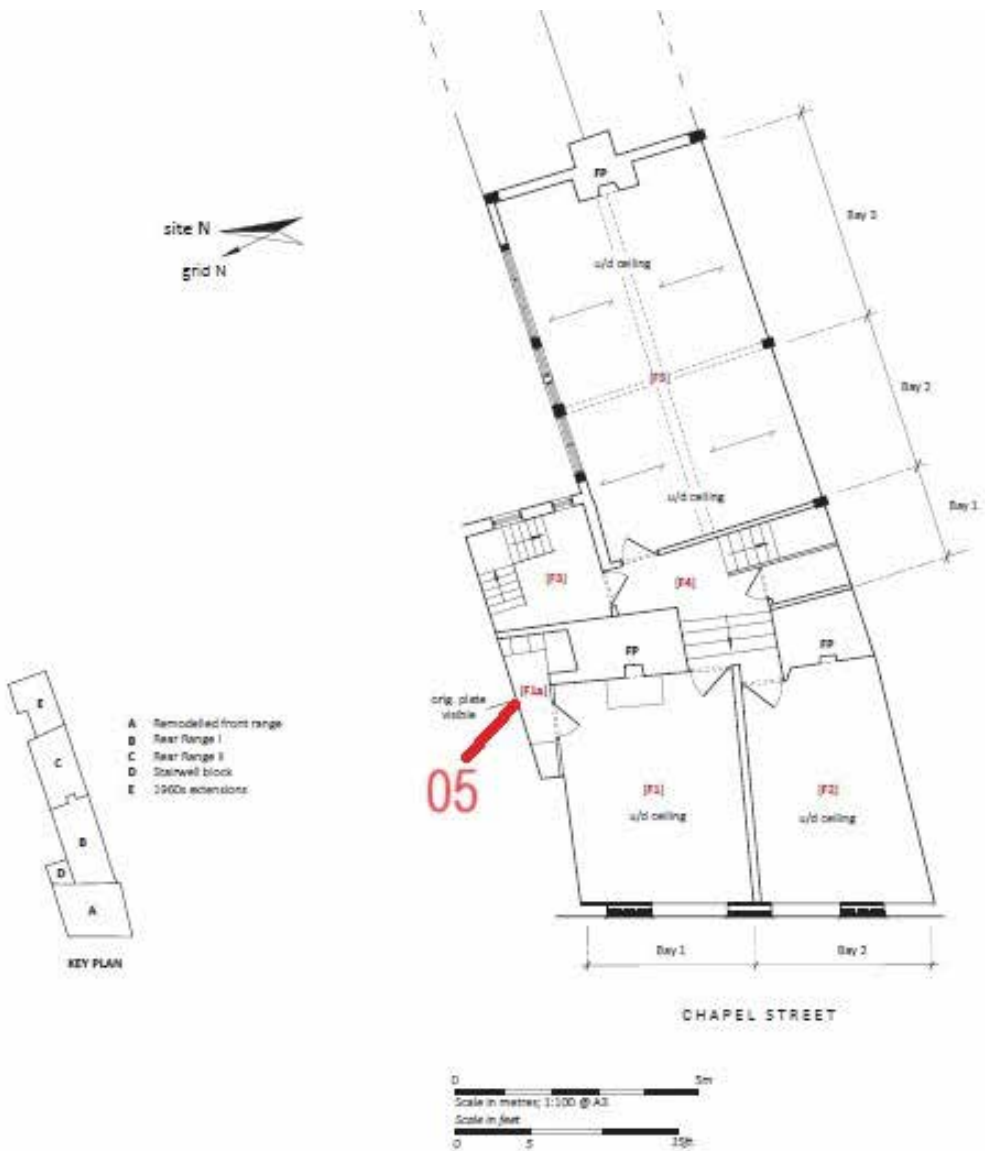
Plan of the first floor of 21 Chapel Street, showing the locations of samples taken for dendrochronology. [drawing by Ric Tyler]
